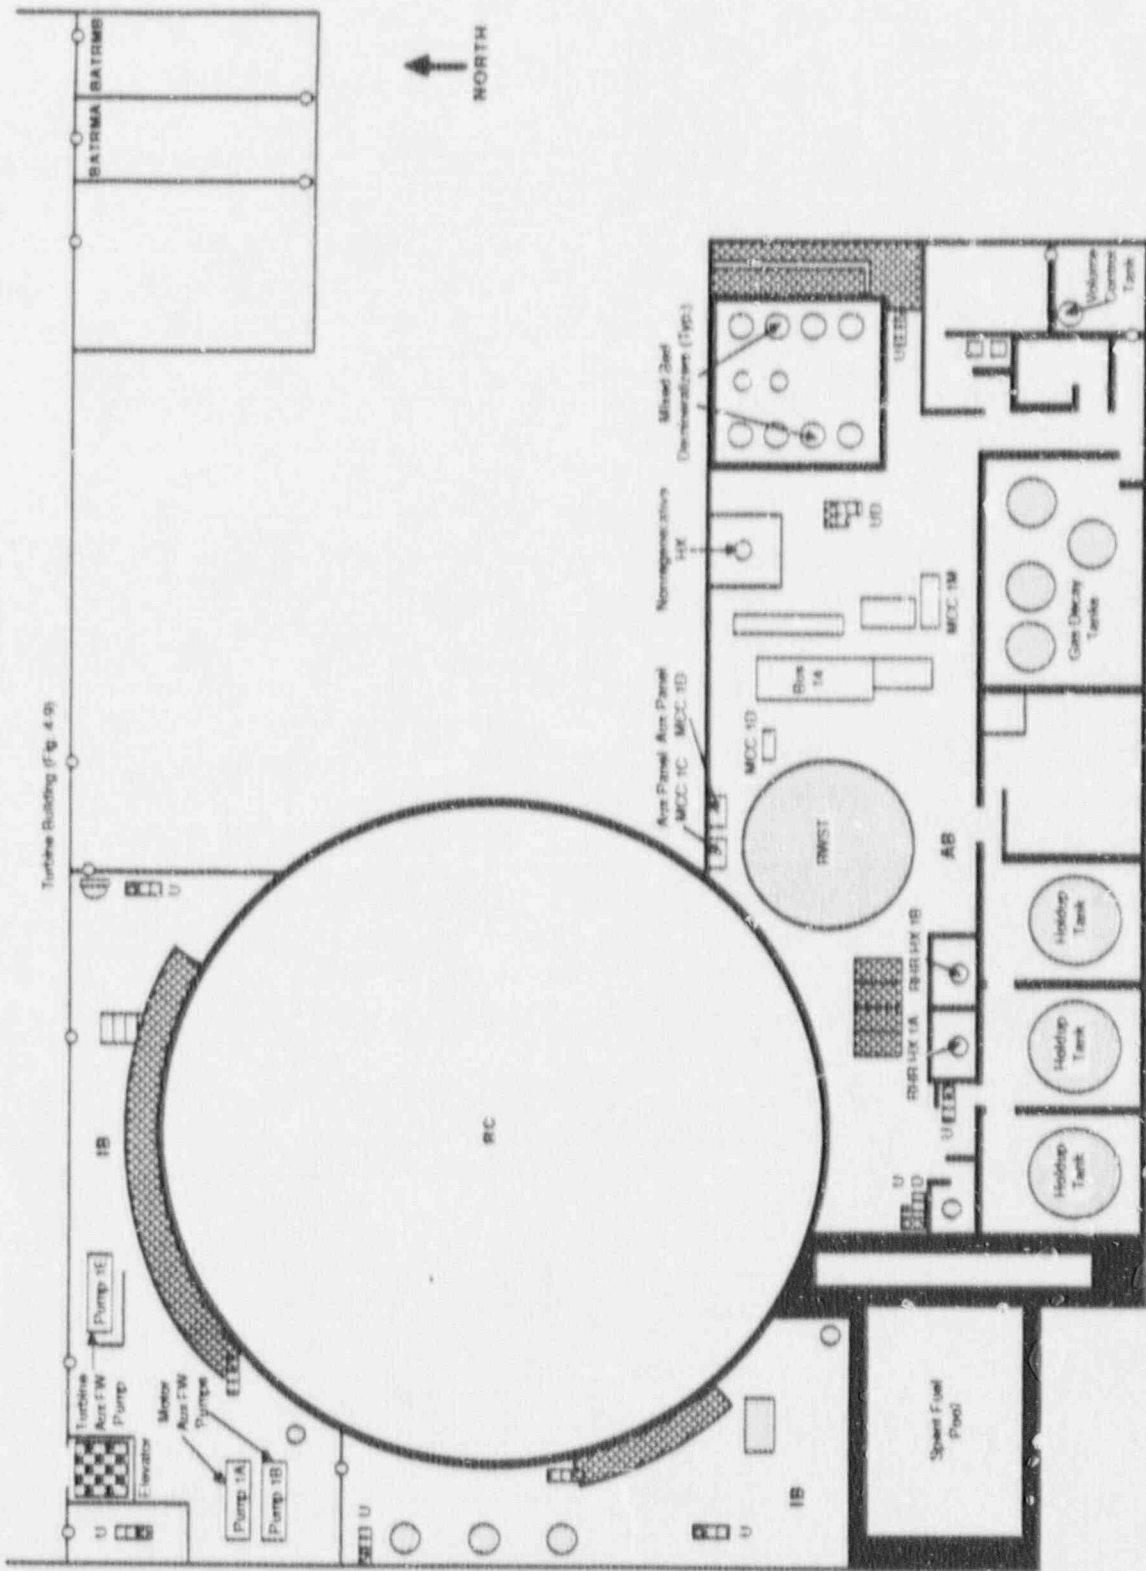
Ginna Reactor Building, Elevation 253'-6"
